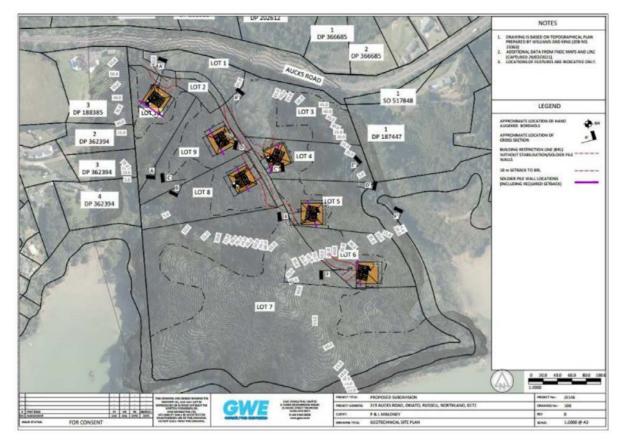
Proposed scheme plan for the proposed subdivision at 319 Aucks Road, Okiato.
